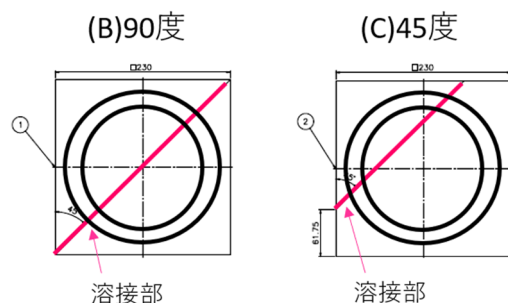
Schematic drawings of the welded plate for the diaphragm.
